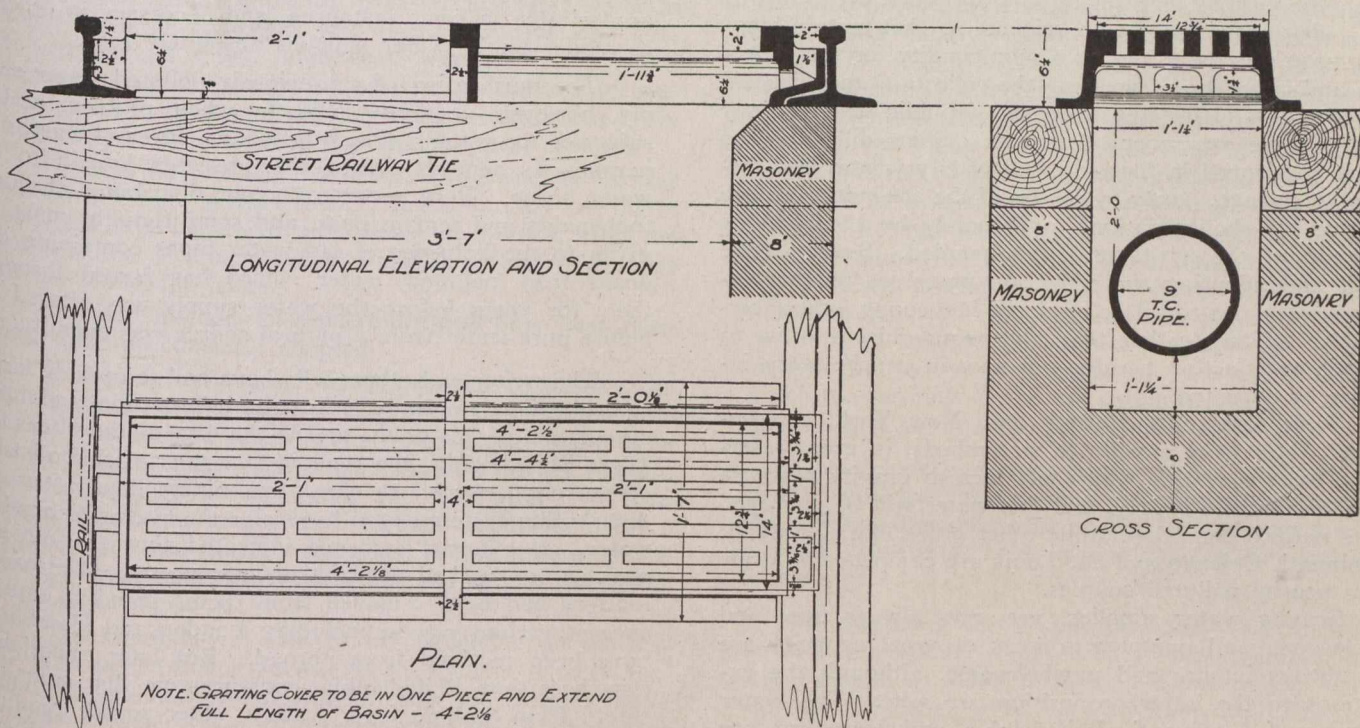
Plan and Sections of Track Basin, St. John, N.B.
